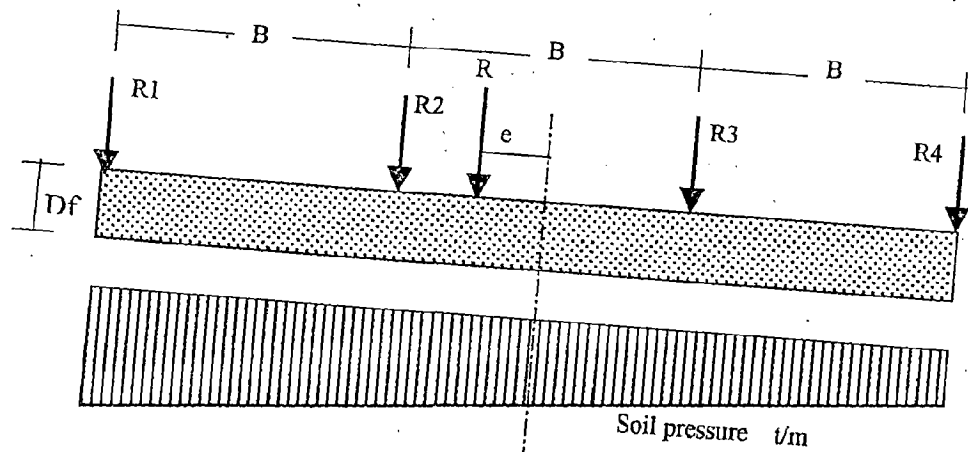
Vertical force acting in the plane of strip foundation
